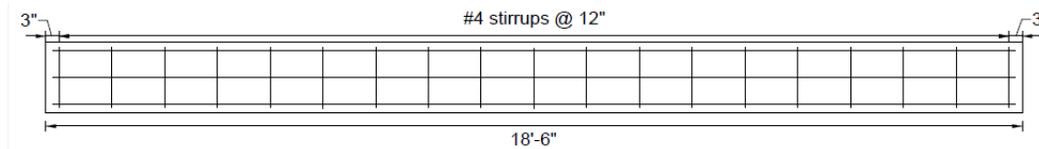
Typical elevation of prestressed, precast concrete beams
